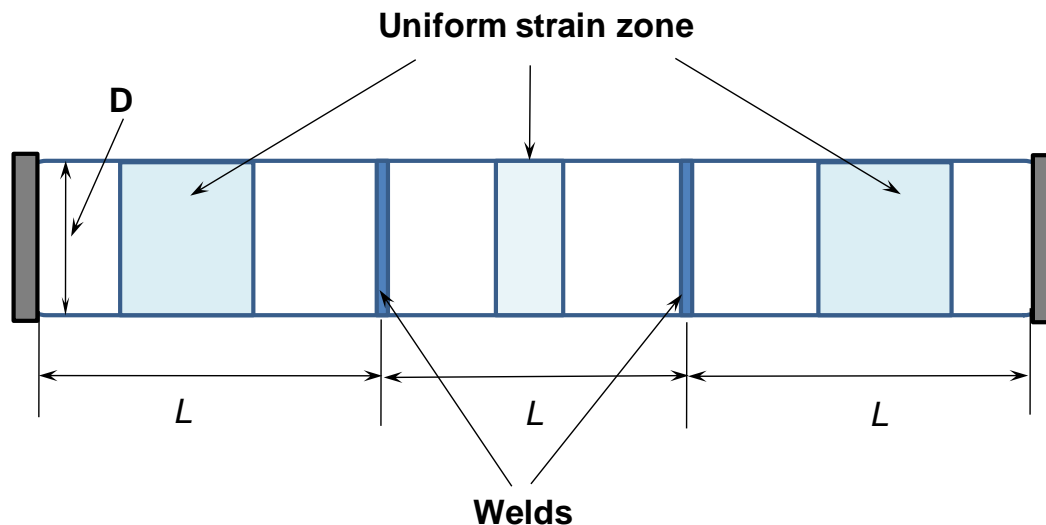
Schematic drawing of the full-scale pipe specimen
